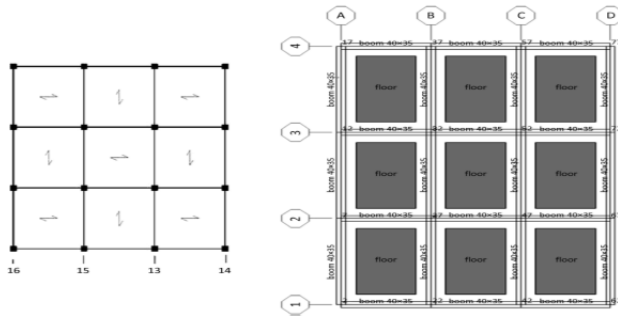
The plan considered for both structures, Plans (along X- coordinate) of the studied structures
